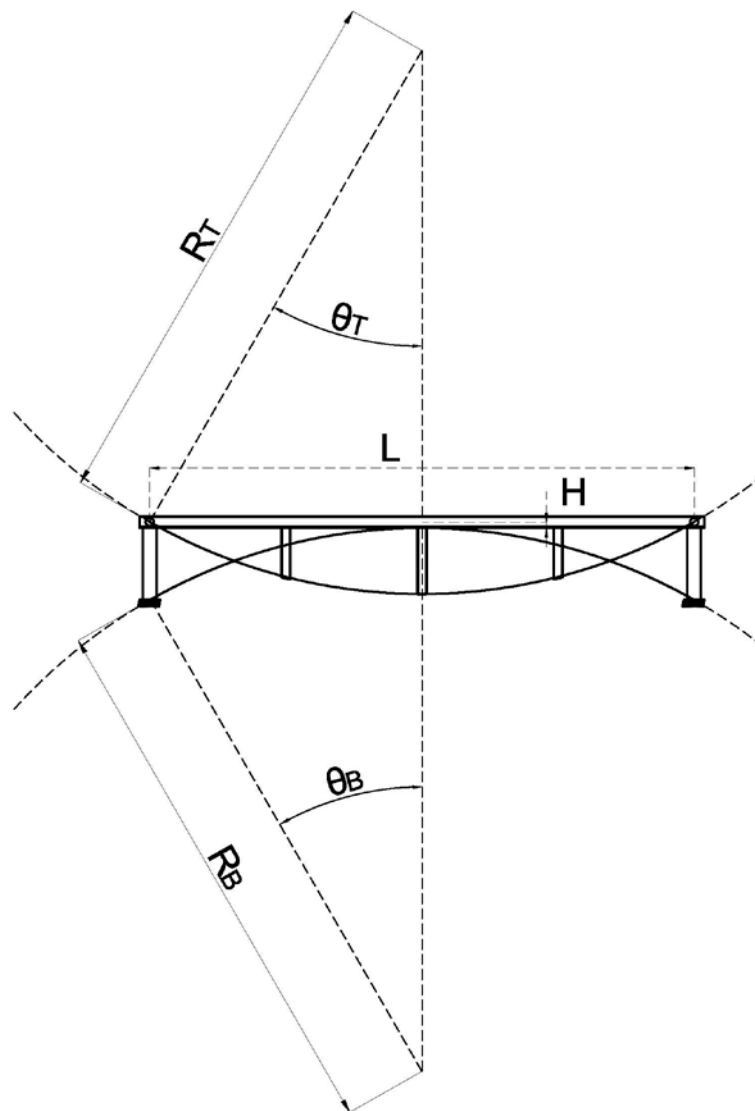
Proposed two-way beam string structures with cable angle control at the top and bottom of the beam.
